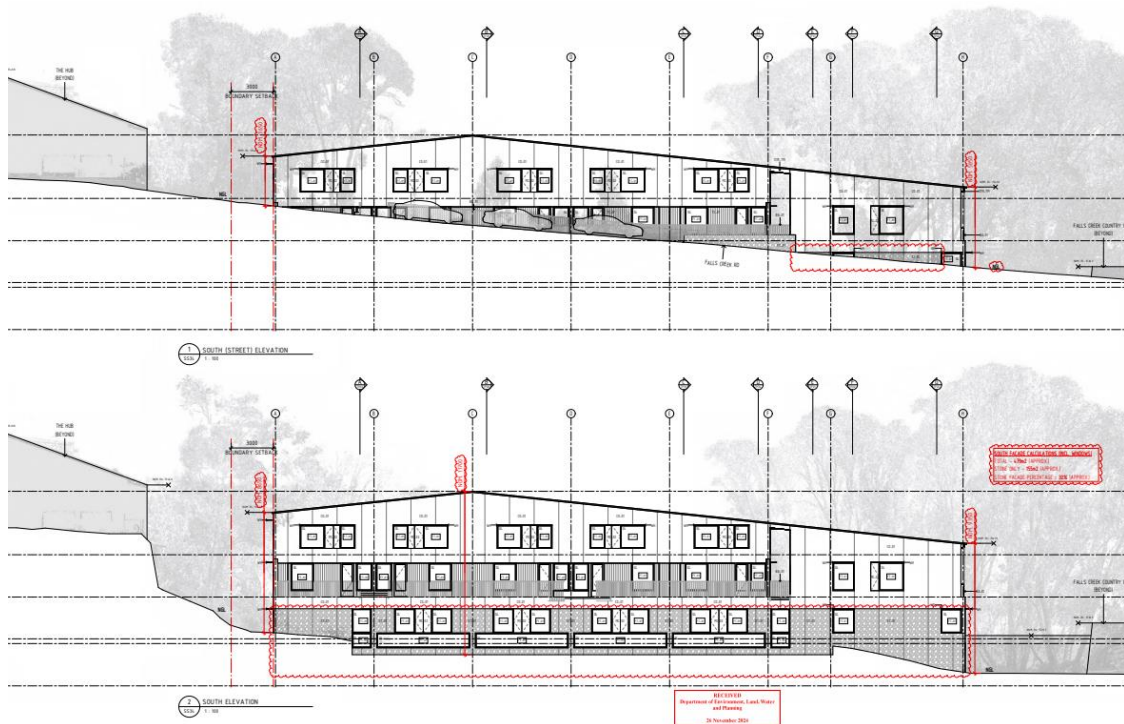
Falls Creek Road elevation (street frontage) – (Source: Application)
